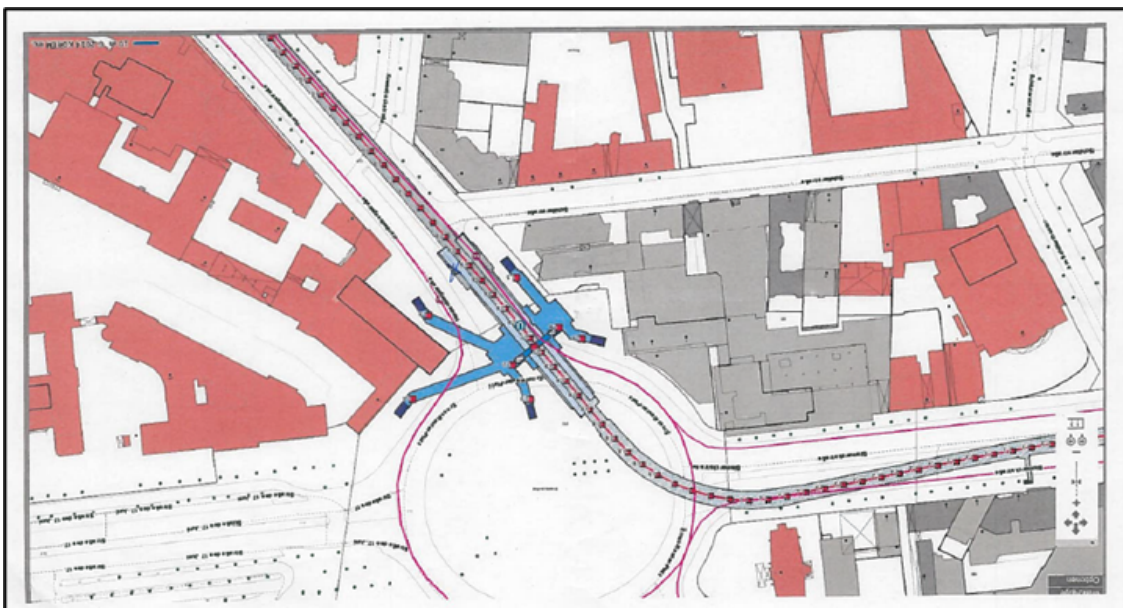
Metro demonstrator system at Ernst Reuter Platz Station in Berlin.
